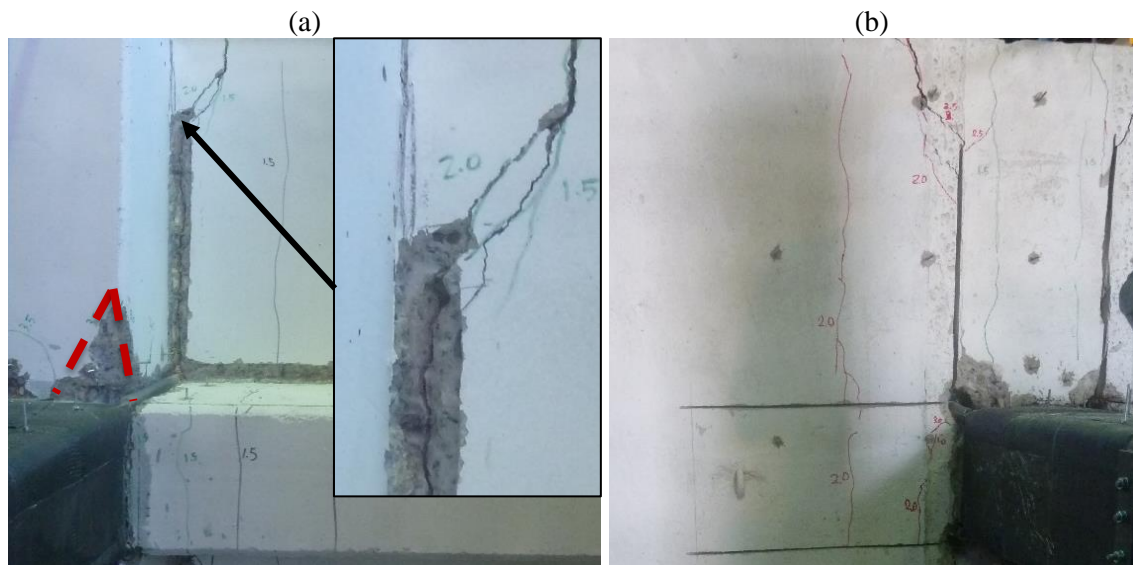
Final damage state in C1-RP-A-sw with significant cracks in beams and slab and concrete wedging due to torsion in transverse beams: (a) view from inferior column, with transverse beam wedging in red (inset: zoom on crack); (b) view from superior column.
